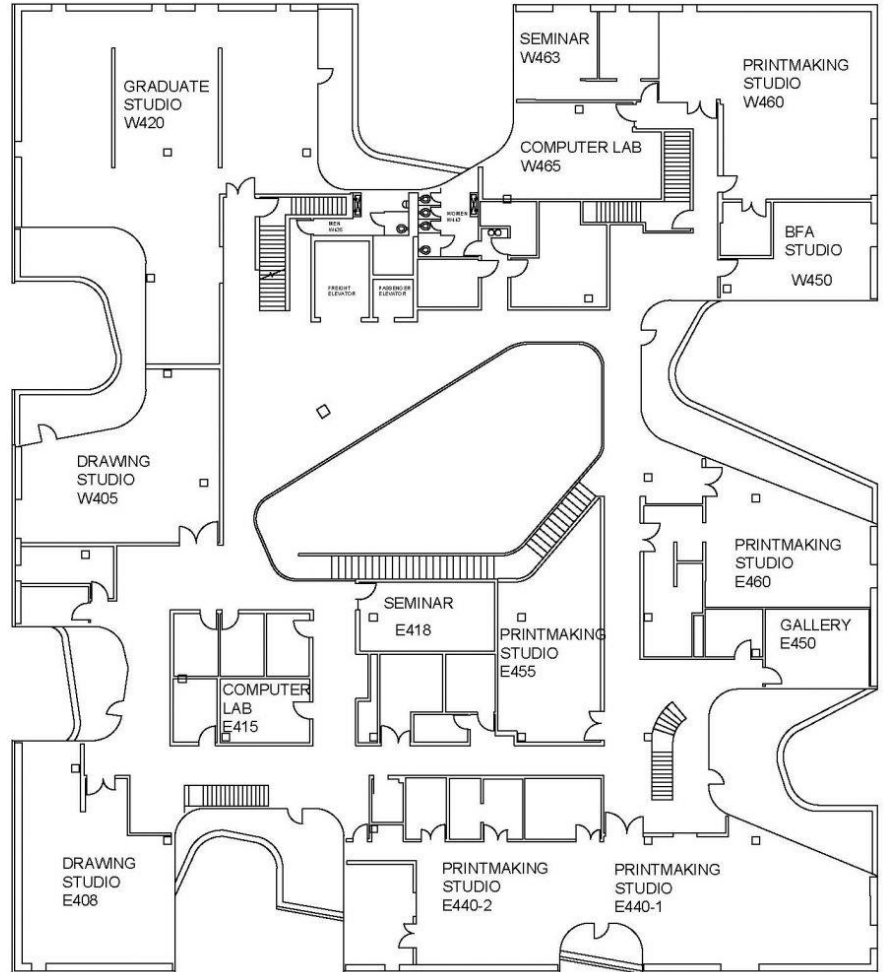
FORTH FLOOR PLAN (CASE STUDY01)
